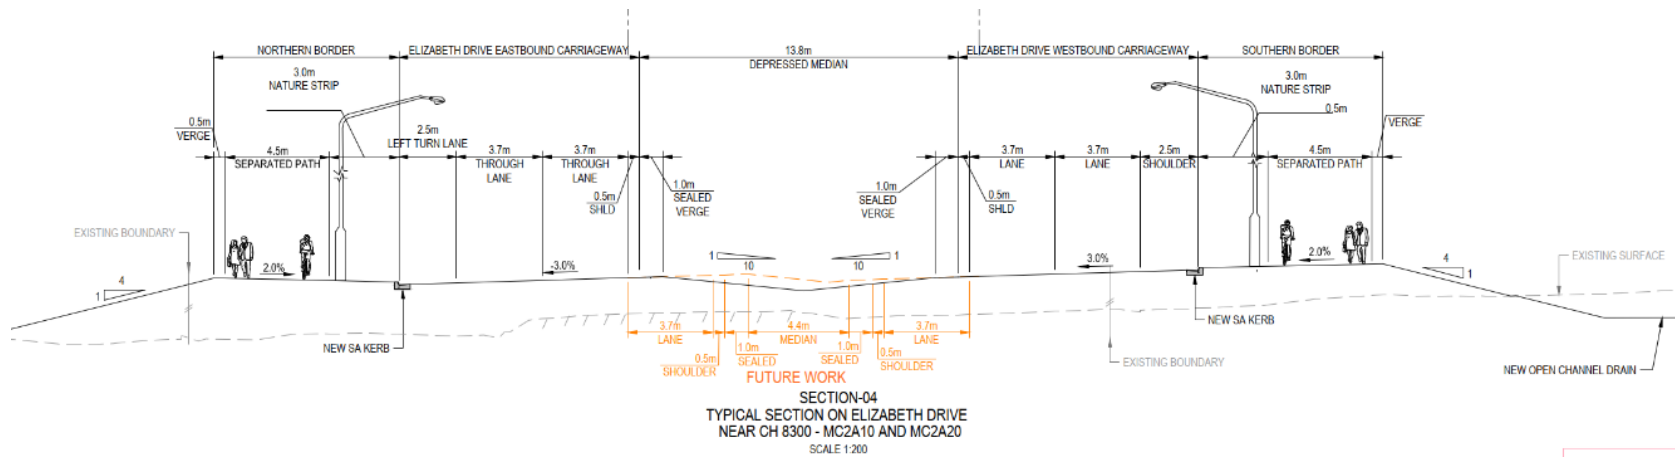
Typical section of proposal on Elizabeth Drive east of Western Road
